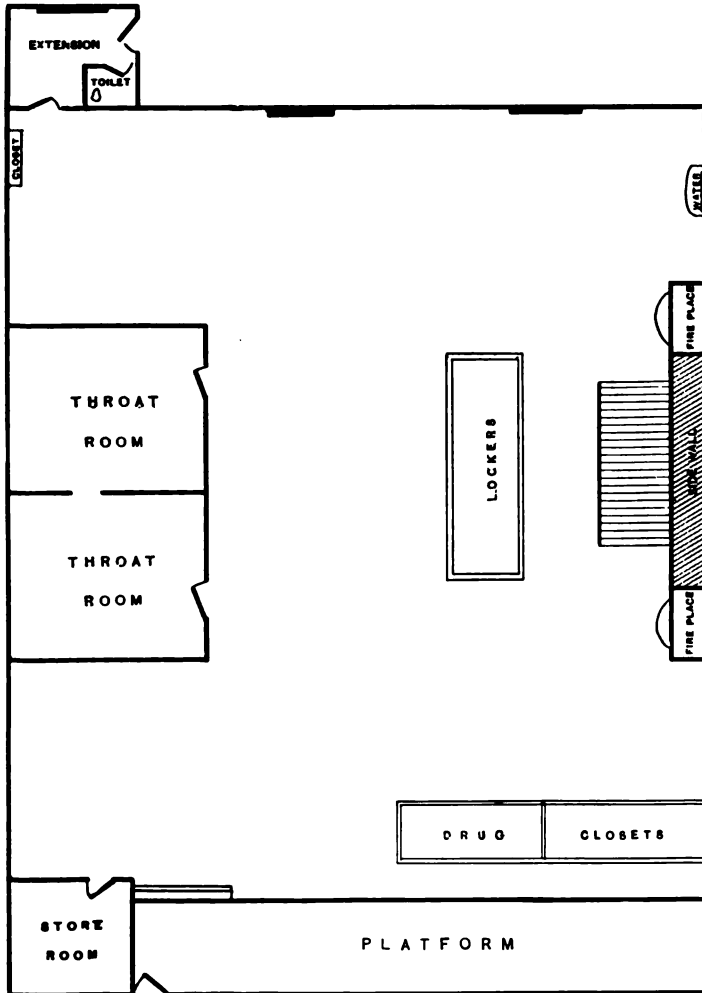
FLOOR PLAN, BASEMENT—BROOKLYN
